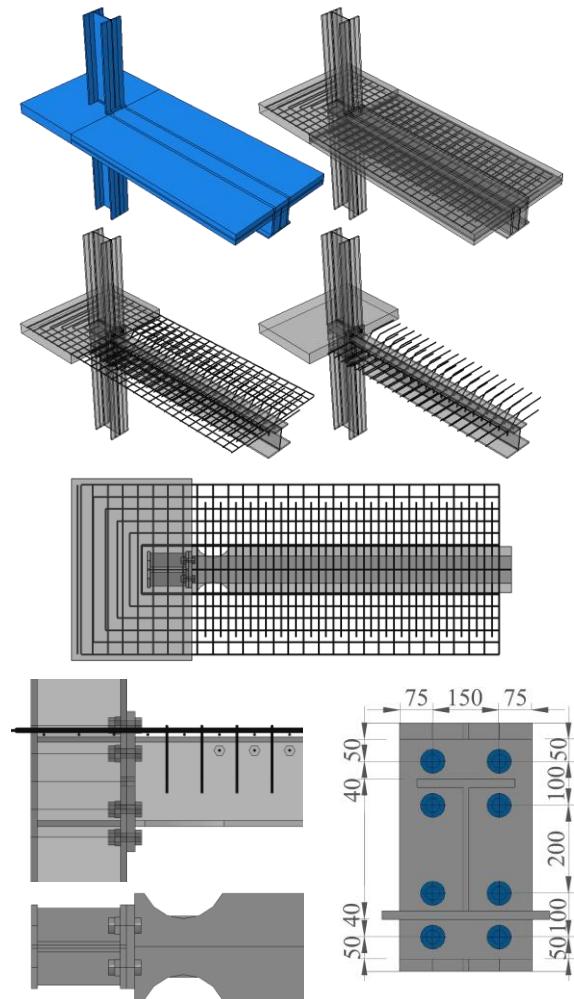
Configuration of the beam-to-column joint model: overall joint, slab reinforcement, bolt rows and dog bone in lower steel plate
